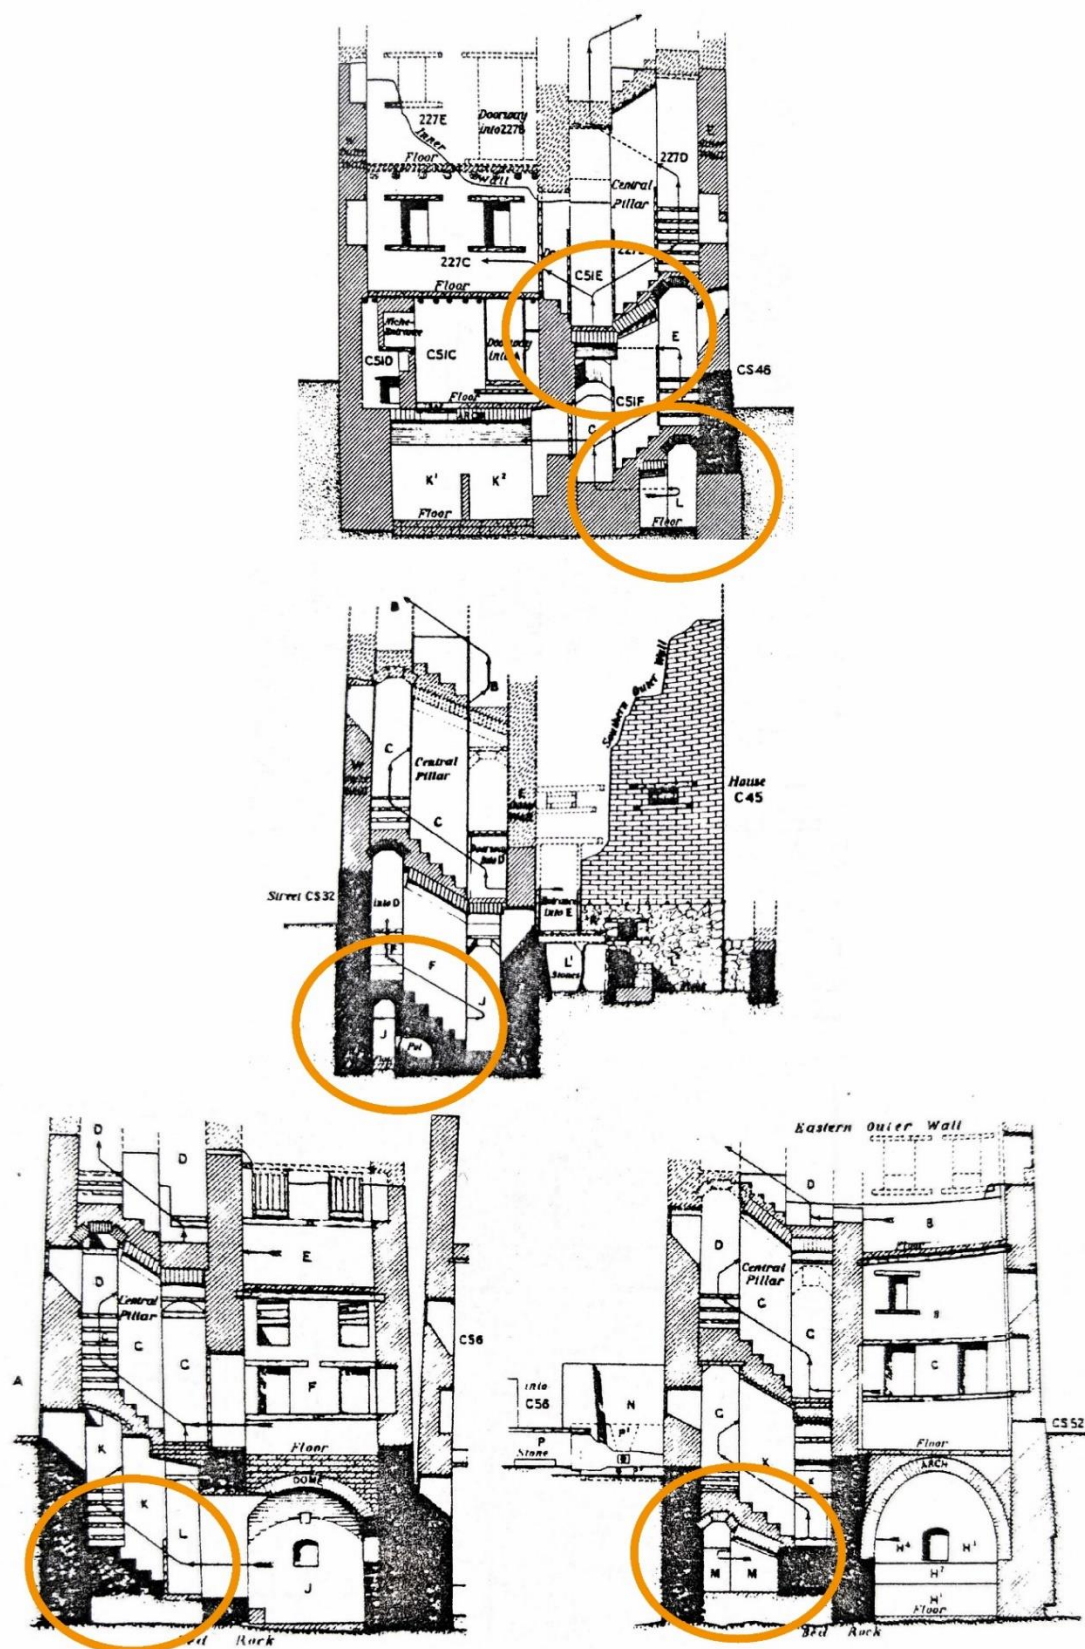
Elevation of a sample of Karanis houses whose staircase architecture exhibits the use of vertical and tilted mudbricks: Karanis house C50/C51 C level looking north (top), Karanis house C43 looking north (middle), Karanis house C62 looking north (lower left) and east (lower right) (Husselman 1979, plans 28, 32, and 41).
